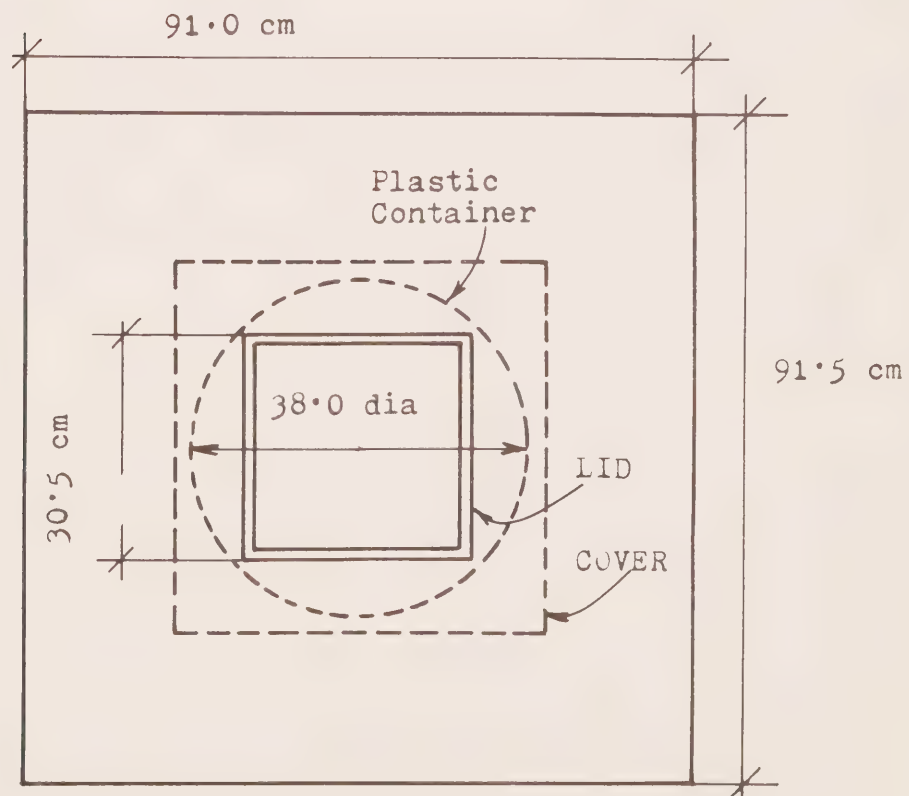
PLAN VIEW OF THE LABORATORY ANAEROBIC PIT
